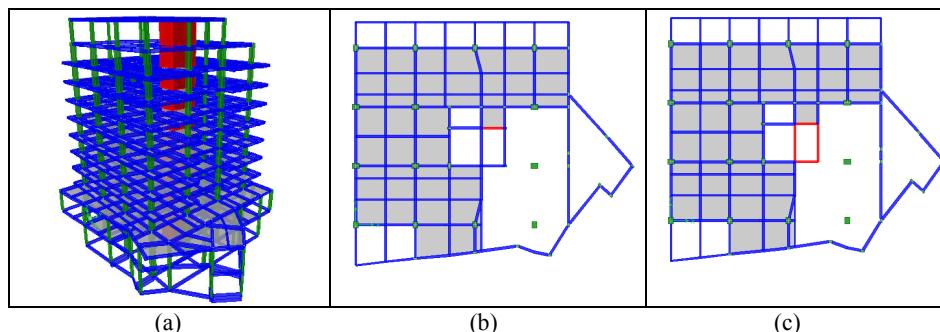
Hotel building model: (a) 3 d image (b) shearwall one sided X direction (c) shear wall two sided X and two sided Y direction.
